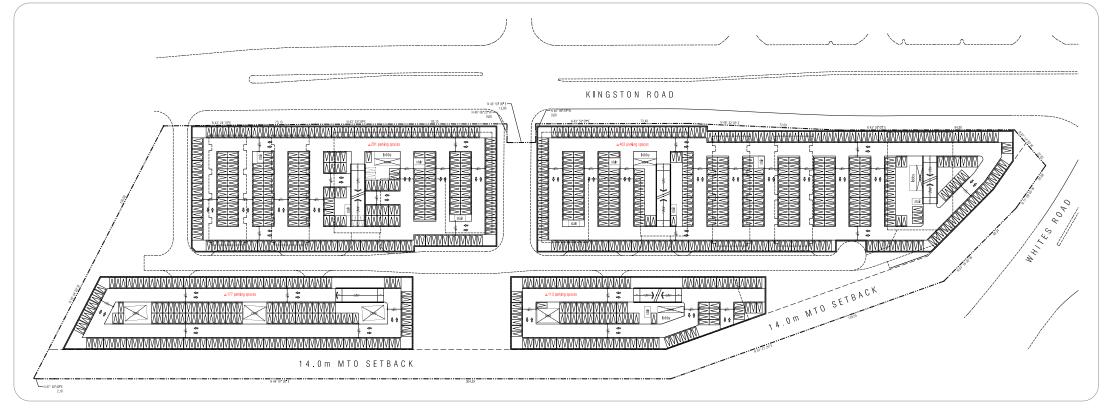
Underground Plan: Prepared by Graziani & Corazza Architects
